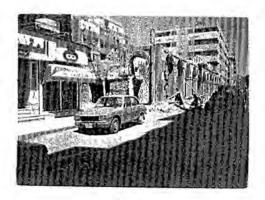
Buildings of more than one storey, in cases of construction default are demolished leaving the ground floor. Such areas of low use are left for long time until complete distruction of ground floor or until tenants receive money to evacuate.
